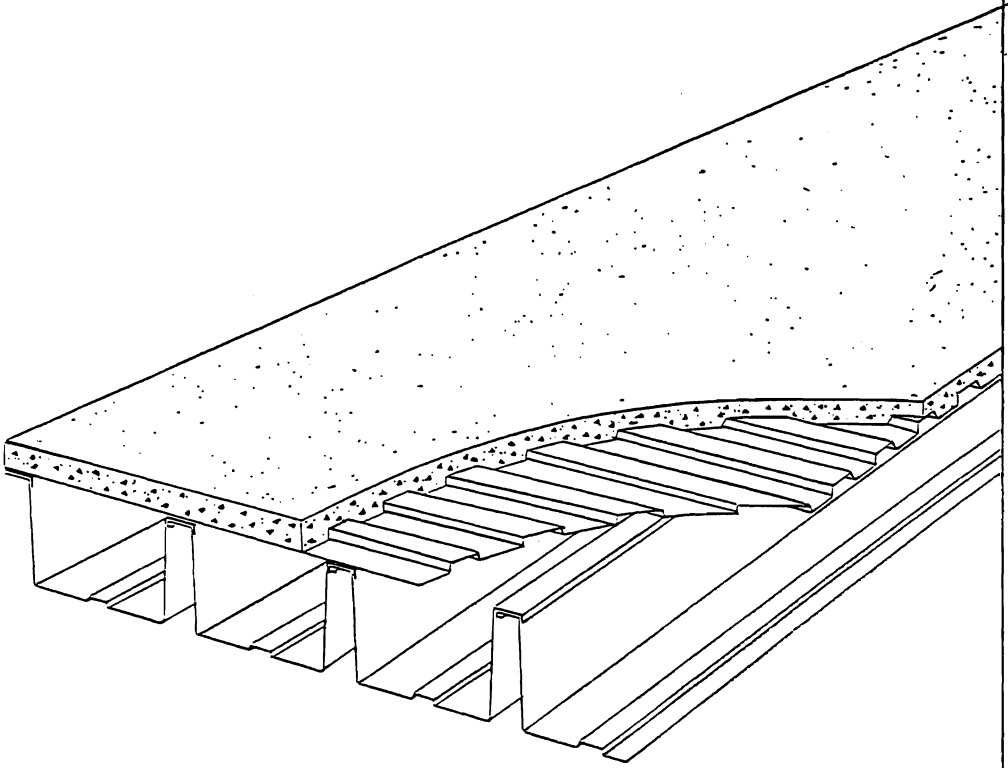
Long-Span Cold-Formed Deck/Concrete Slab Composite Floor System
